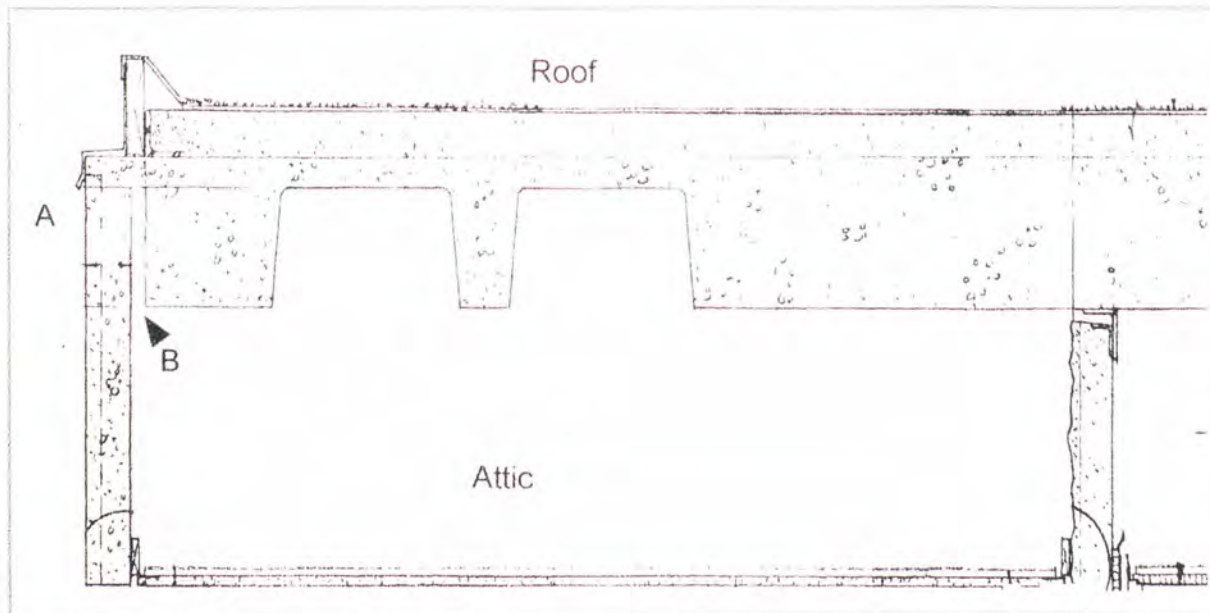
Schematic illustration of area used by bats in buildings at Seminole Community College. The roost entrance (A) is also shown in Figure 3(A). Bats roost in the expansion joint (B) between the outer concrete wall and the attic wall. They are also found in the space beneath the metal flashing. Bats were never seen in the open areas of the attic.
